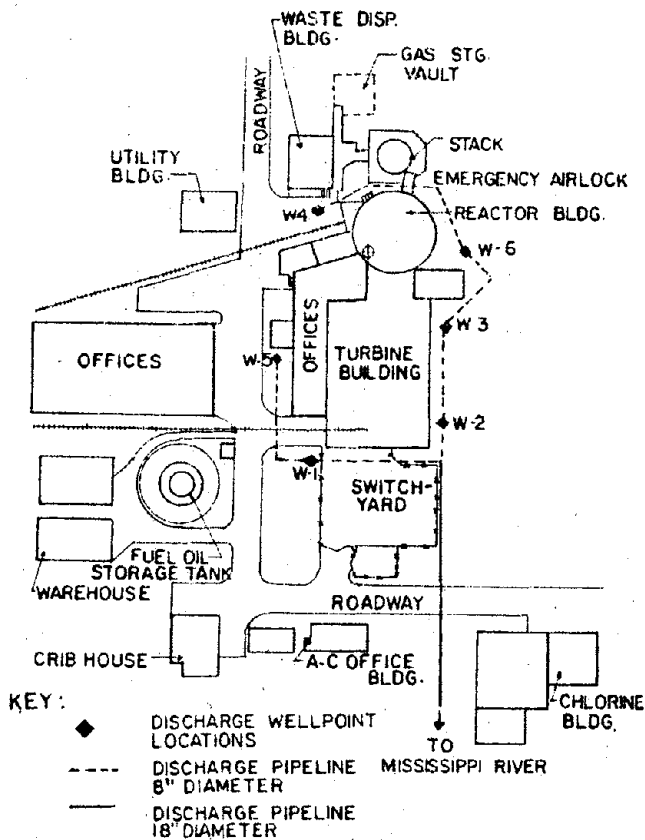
PLOT PLAN SHOWING WELL LOCATIONS
